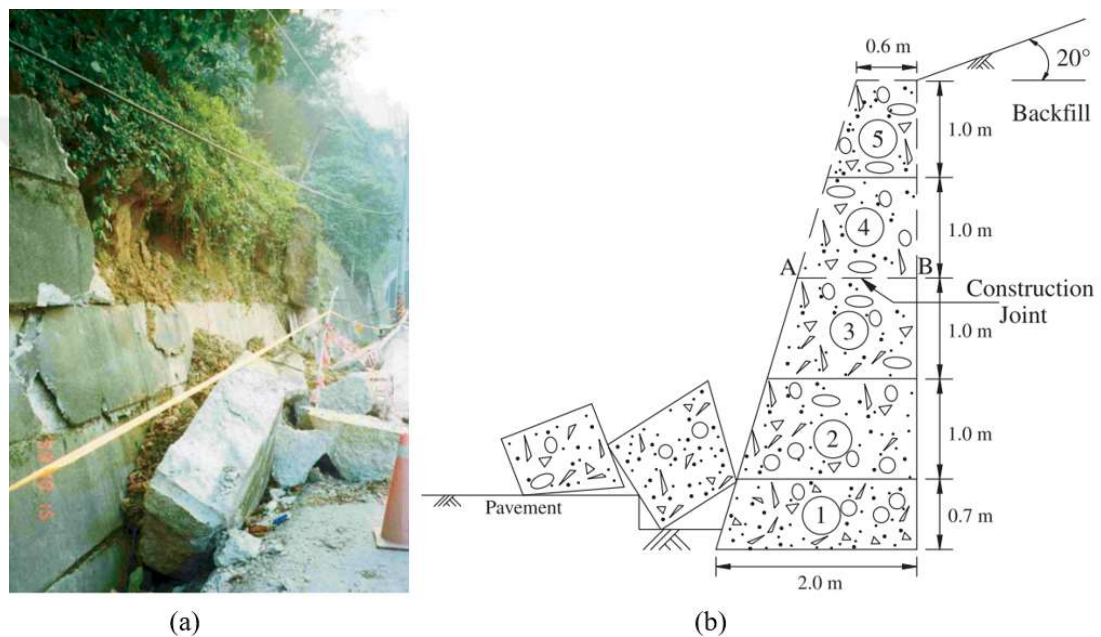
(a) The picture of the failed gravity wall, (b) The cross sections of failed wall [11].
